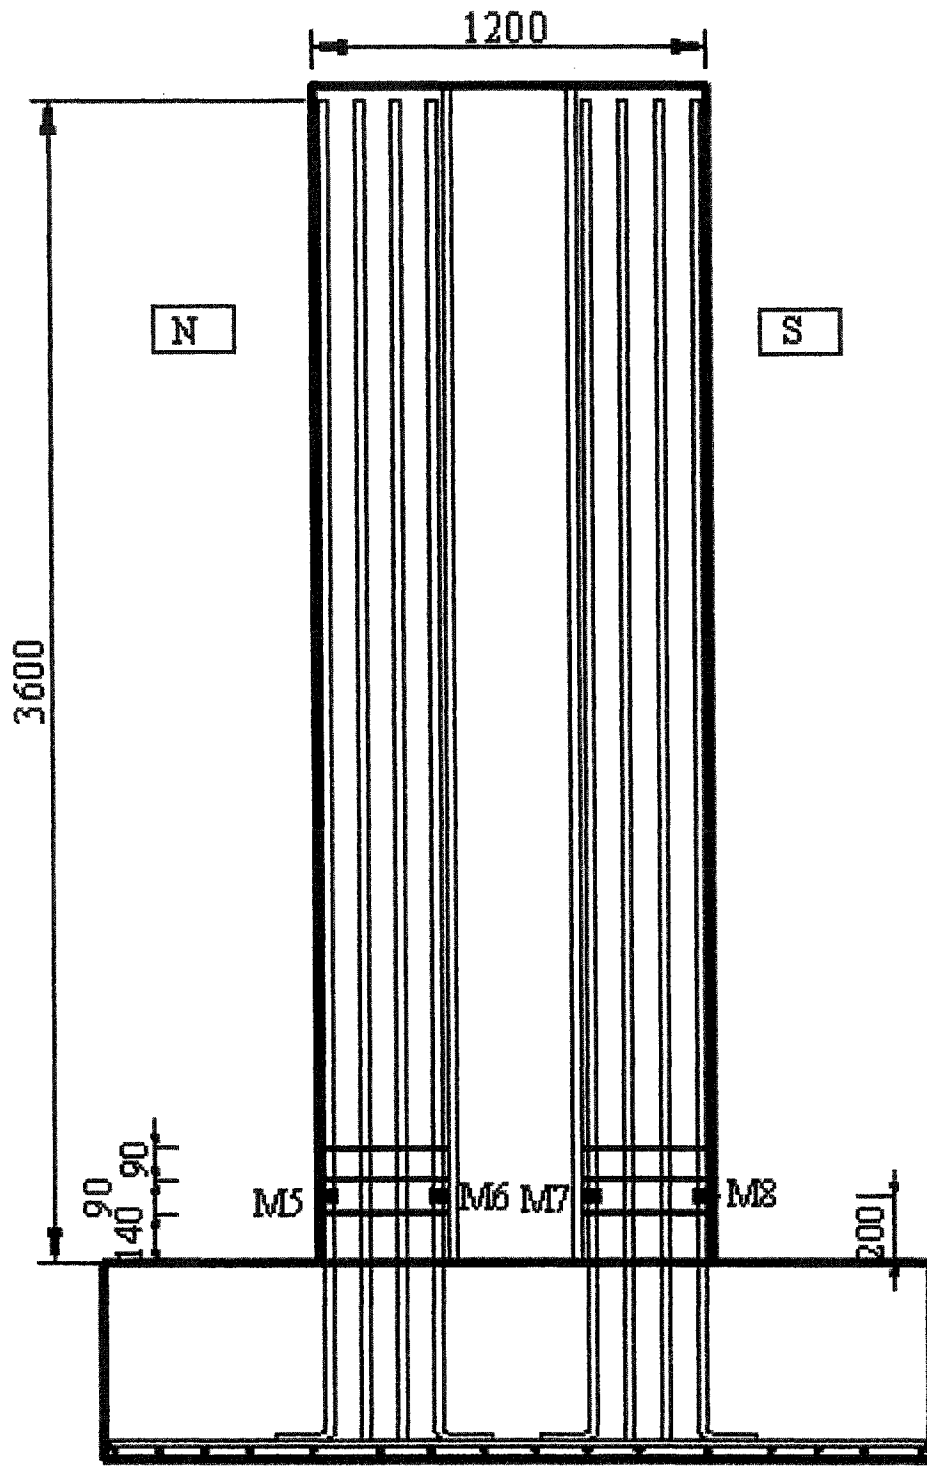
(a) W-2 Strain gauge layout in east elevation
